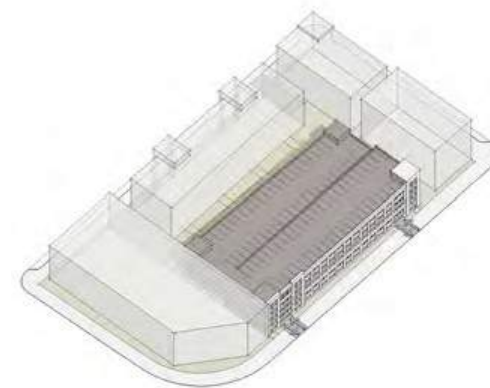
Example of stand-alone parking structure, wrapped by building
